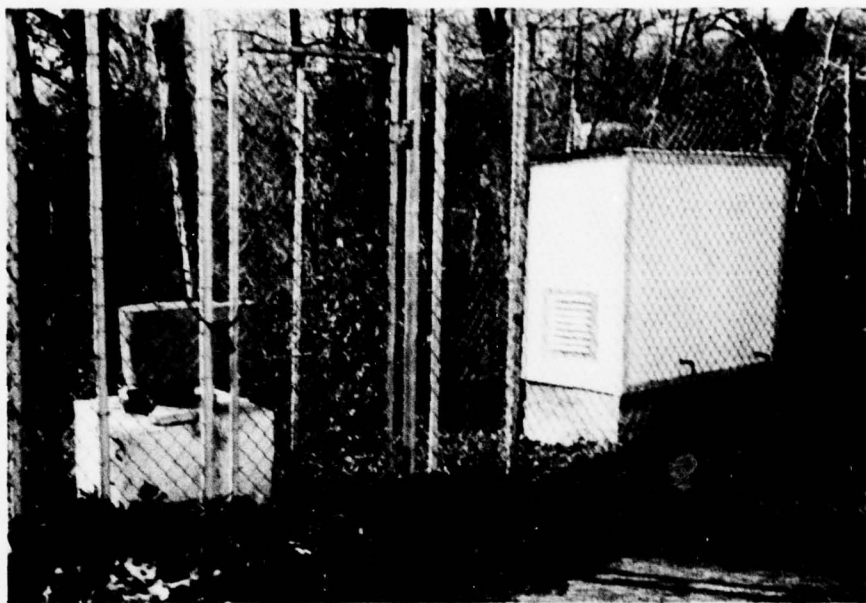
View showing tunnel vent (left) and aerator compressor (right) at crest of dam.
